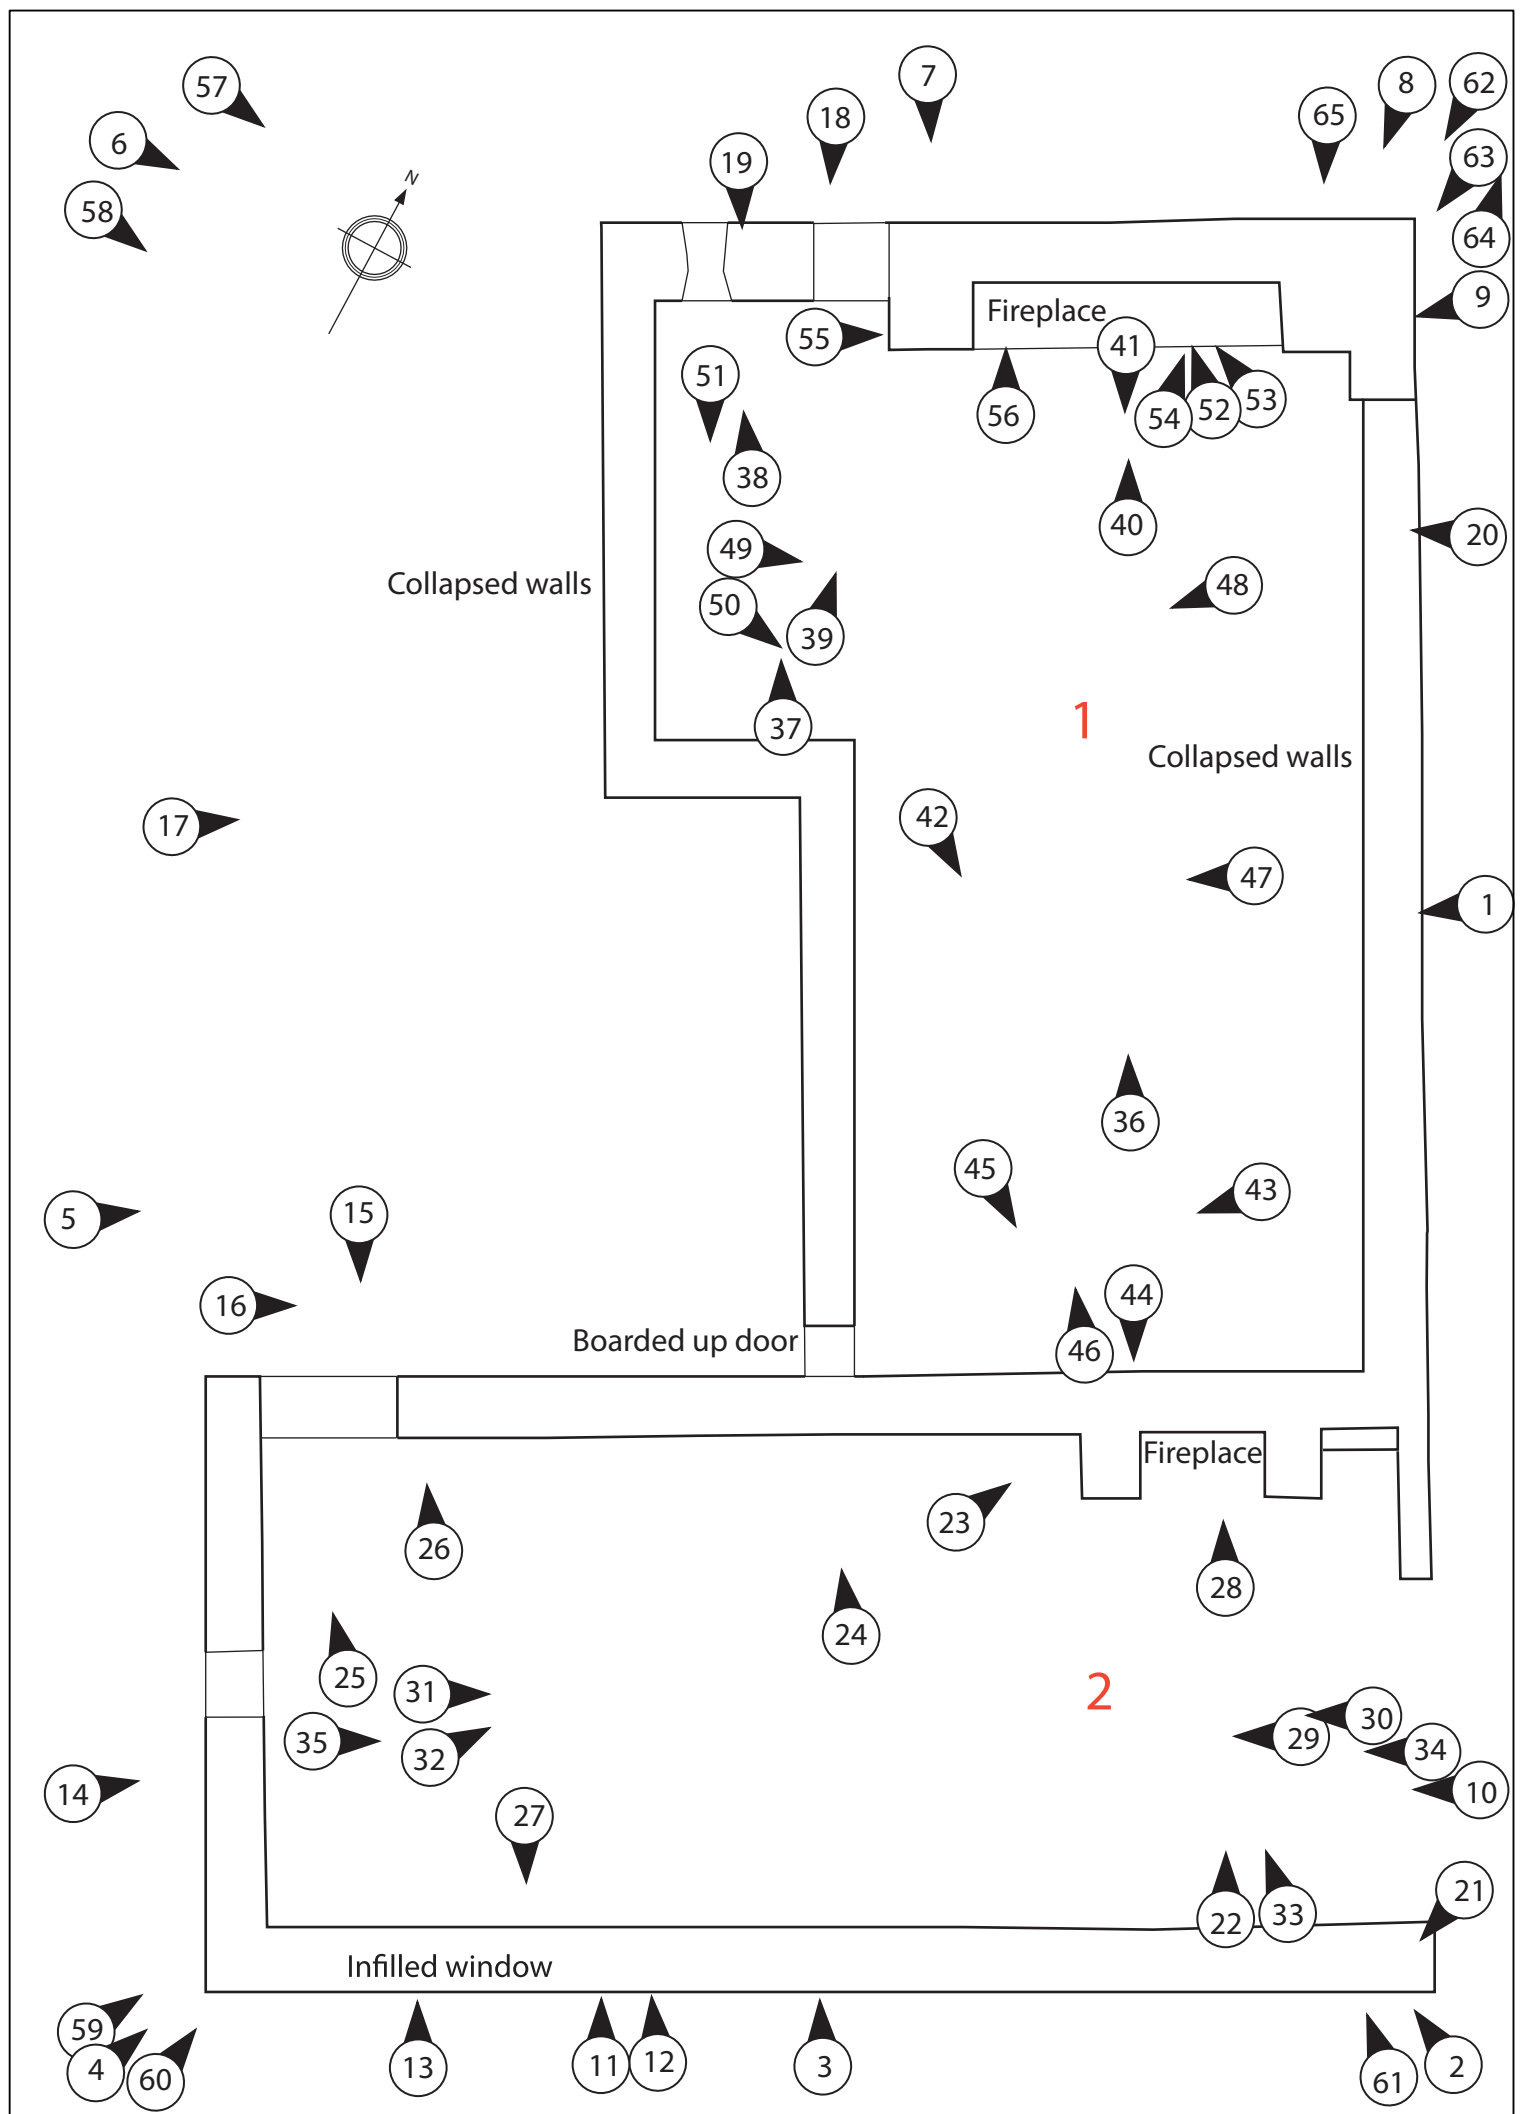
Sketch plan detailing location and orientation of photographic archived. Not to scale.
